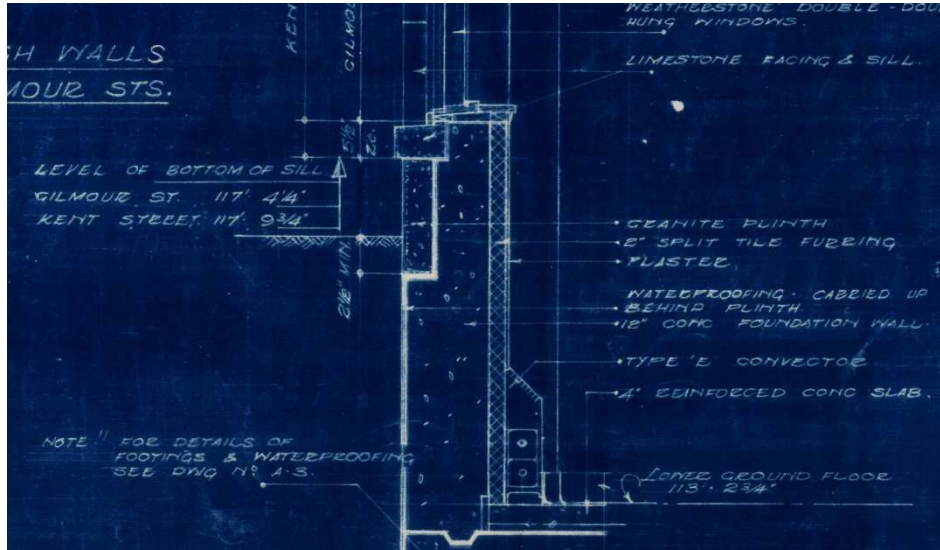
Detail section through the Kent and Gilmour Street façades. A 100mm thick granite plinth is detailed in the drawing. Source: Original 1955 Drawing Set A4.
